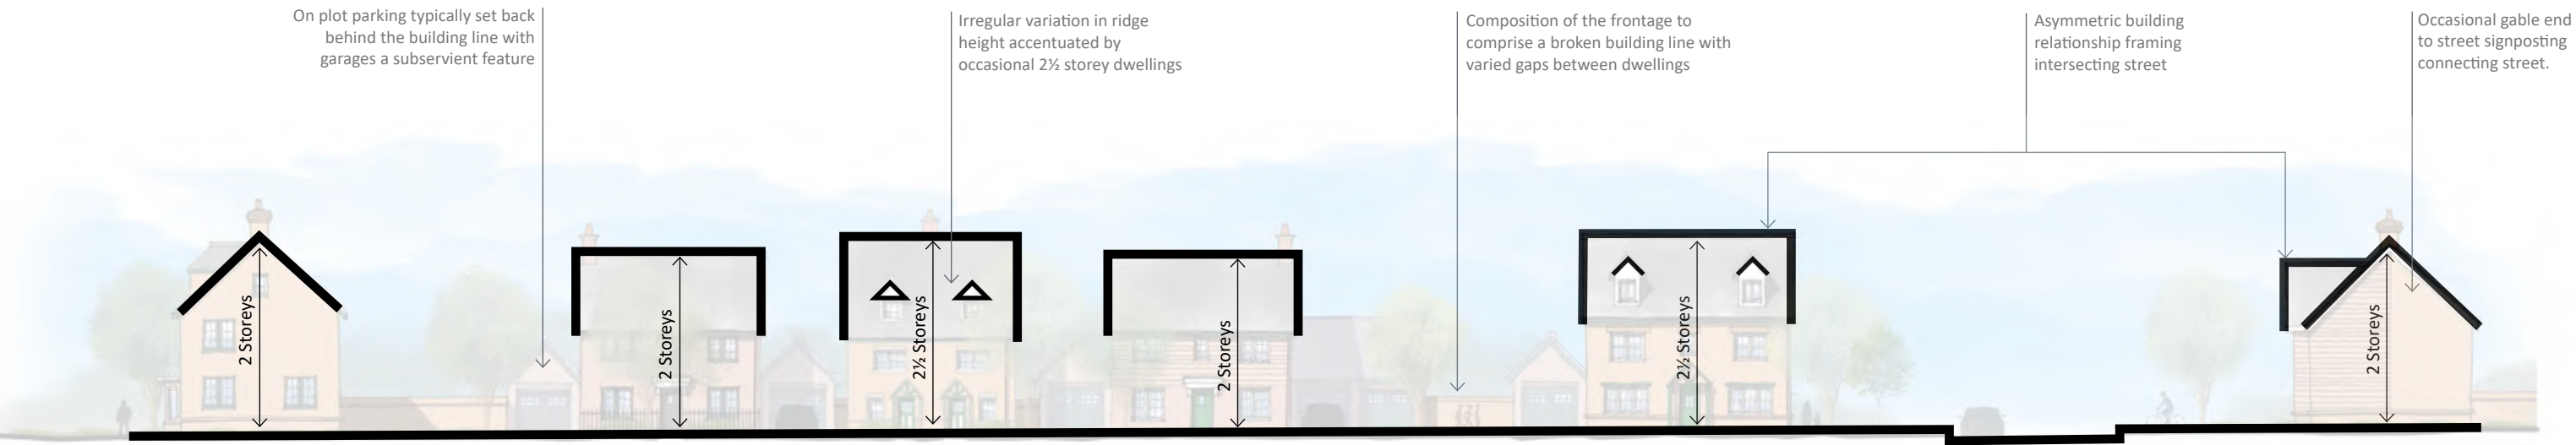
'WARM' STREET ELEVATION PRINCIPLES
